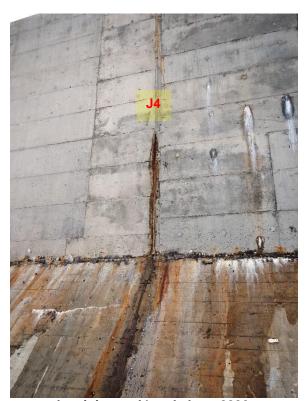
Seepage and staining at J4 and along 2006 construction lift contact.
